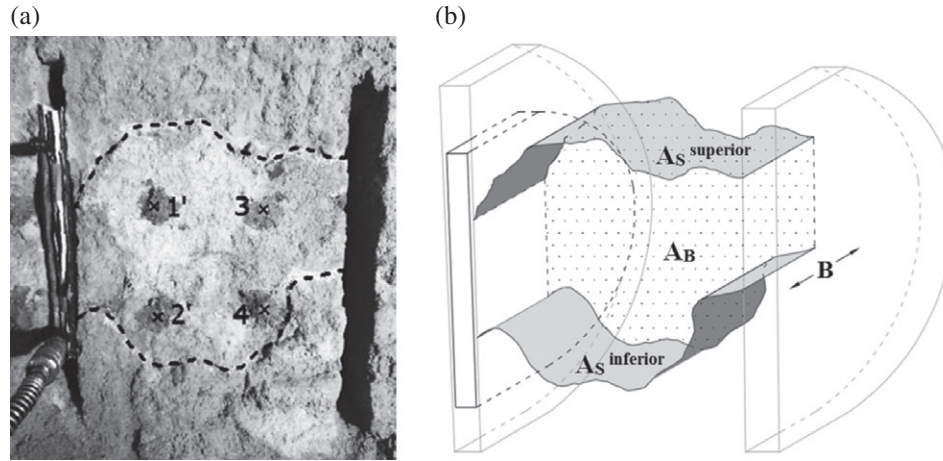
Shear test P.1: (a) frontal cracks on the masonry; and (b) sliding surfaces hypothesis.
